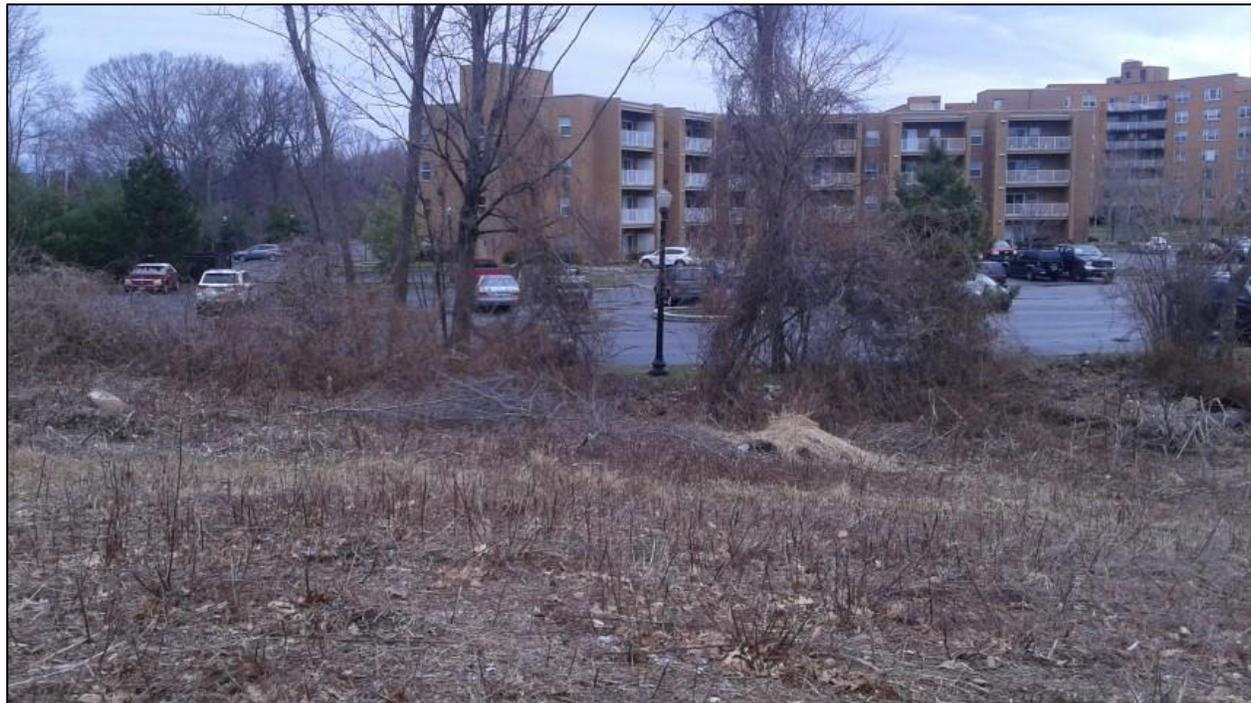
Overview photo of the area to the west of the Mix Avenue Substation facing north (note disturbed areas and debris in this area).
